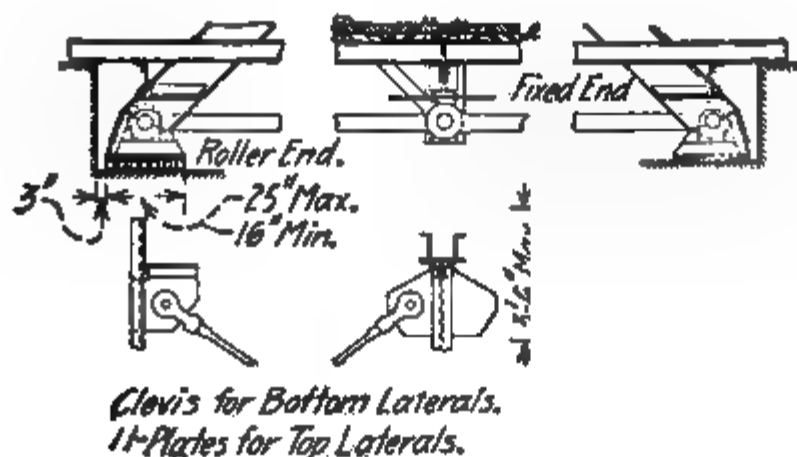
SHOES AND FLOOR DETAILS FOR PIN-CONNECTED HIGHWAY BRIDGES. (AMERICAN BRIDGE CO.)
